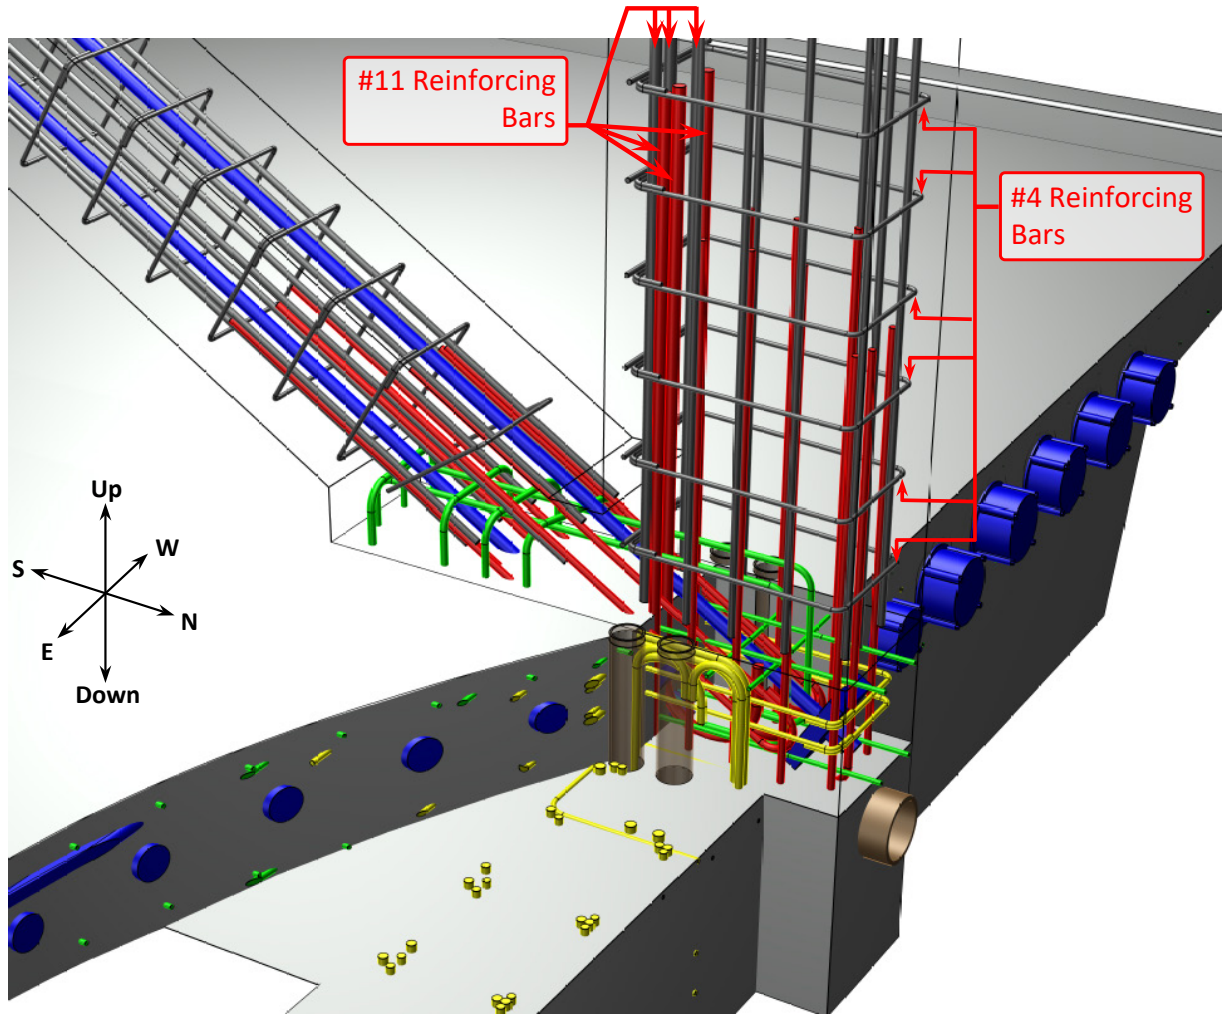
Cutaway illustration showing the reinforcing bars and conduits within and near the base of truss member 12.
